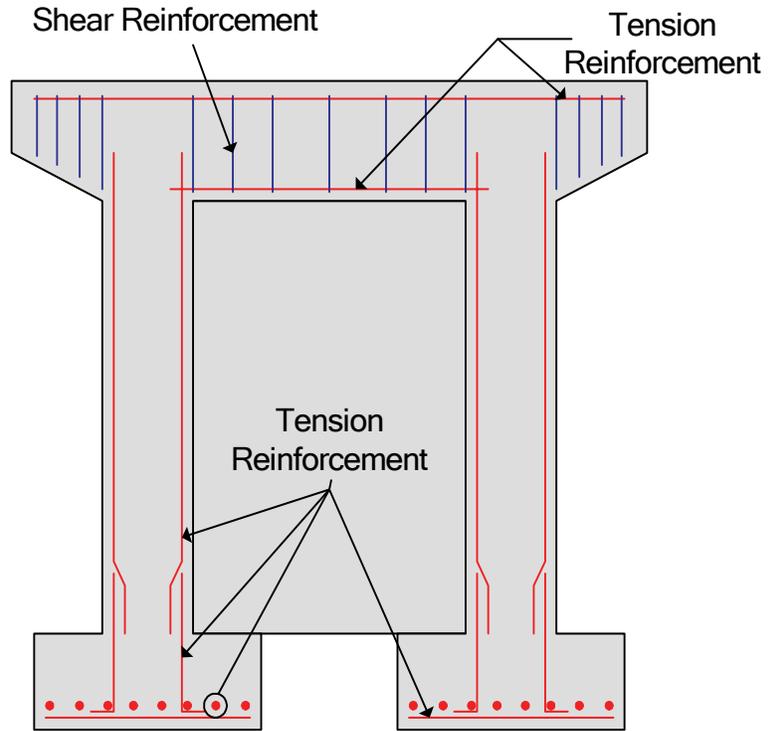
Primary Reinforcement in Column Bent with Web Wall
